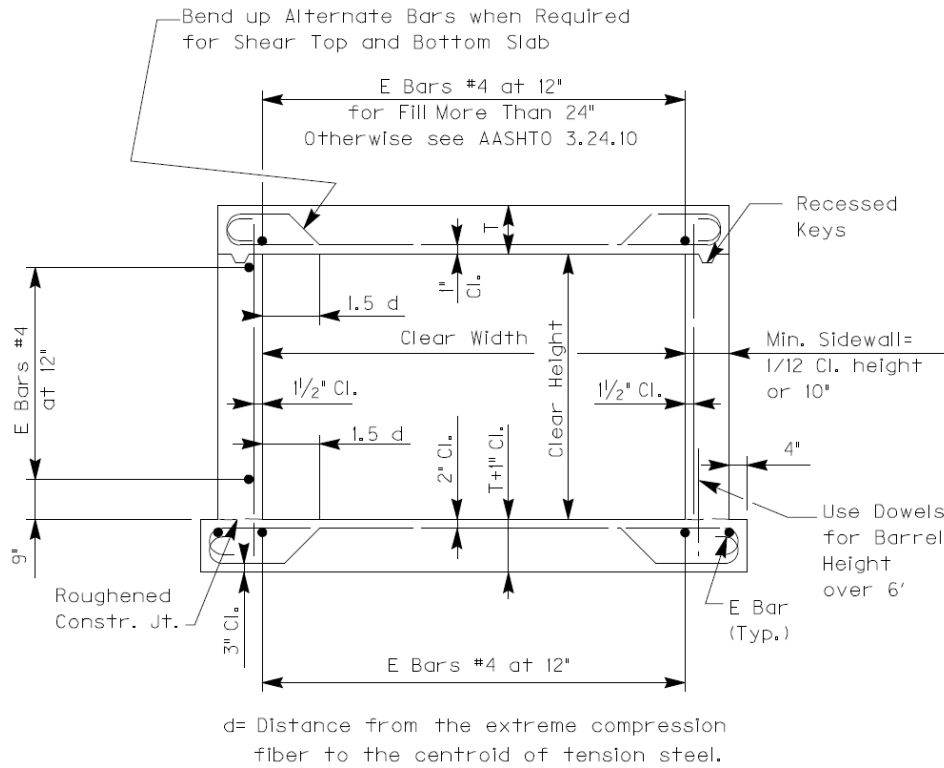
Typical KYTC Single Barrel Cast-in-Place Box Culvert Cross Section (KYTC 2005)
